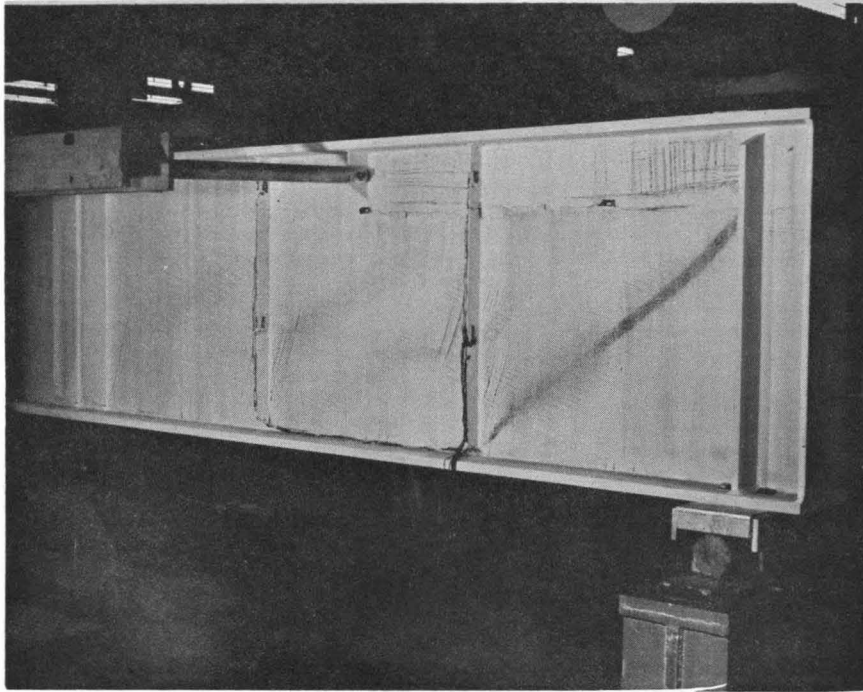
Yield Patterns in Girder LS4 at Load No. 18
